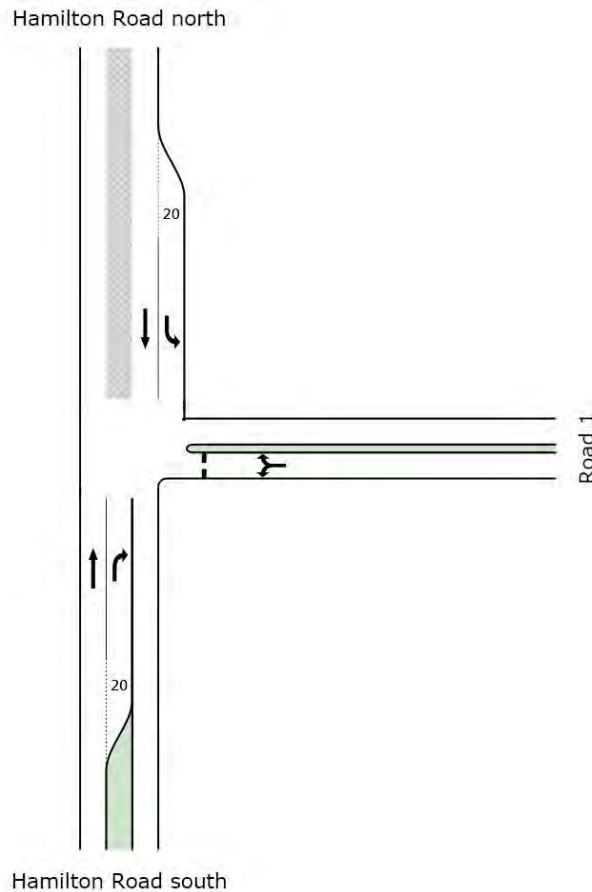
Preferred intersection layout (Hamilton Road and Road 1)
